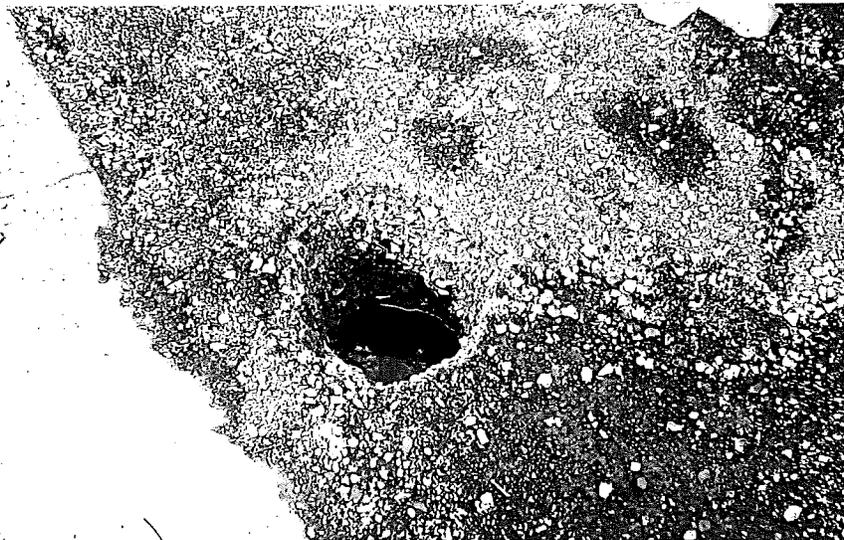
Level of water in slag fill inside of caisson no. 4 about one week after drilling test wells. Level 9-10 in. below top.
